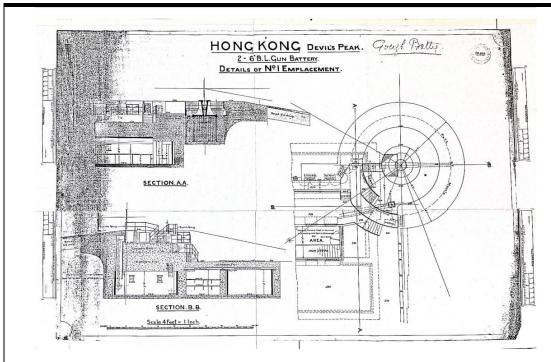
Details of the No. 1 6-inch gun emplacement of Gough Battery. It is believed that the No. 1 emplacement was later upgraded to the existing 9.2-inch gun emplacement.
